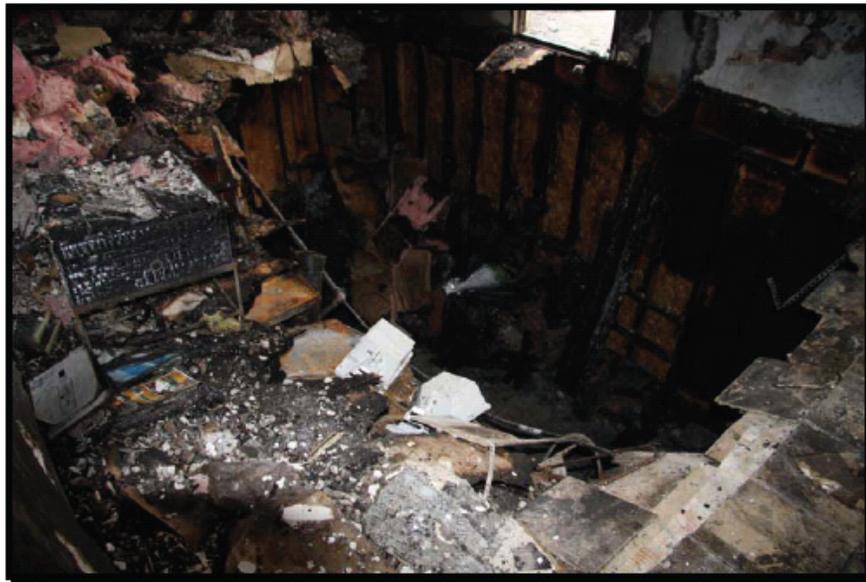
Interior photo of the collapsed area and flooring system. (Colerain Fire & EMS)
